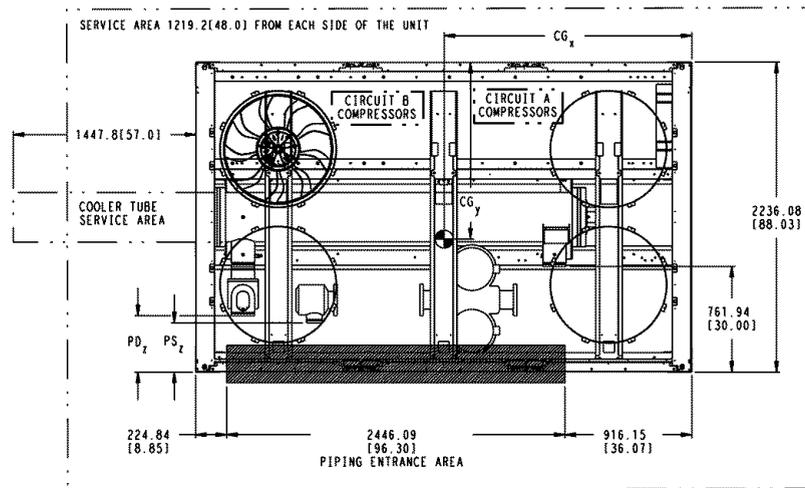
30RB080 Air-Cooled Chiller Dimensions
